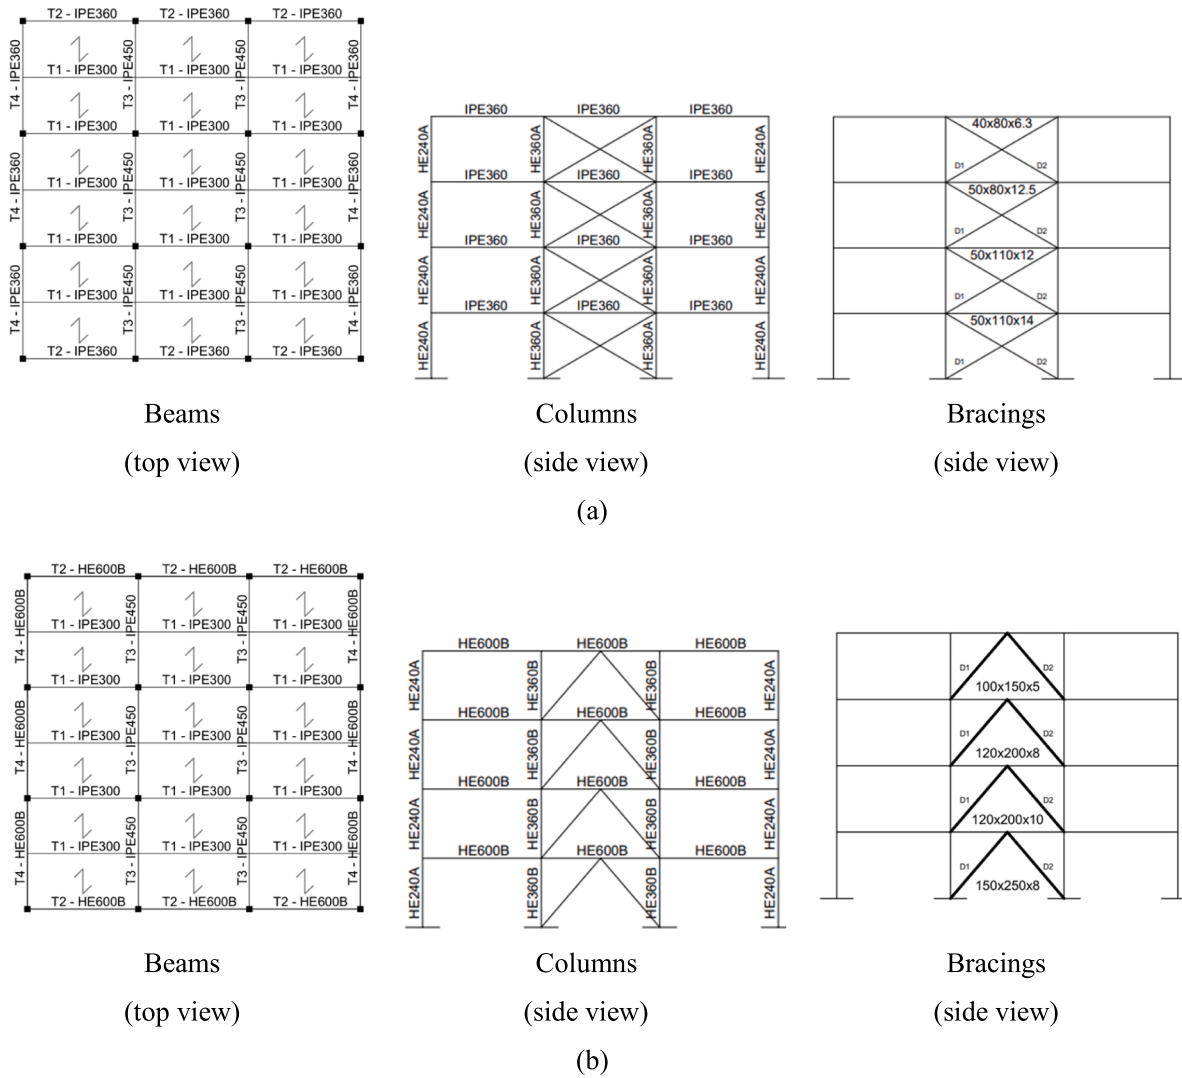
Structural detailing and resisting cross-sections for the examined (a) STR1 and (b) STR2 buildings.
